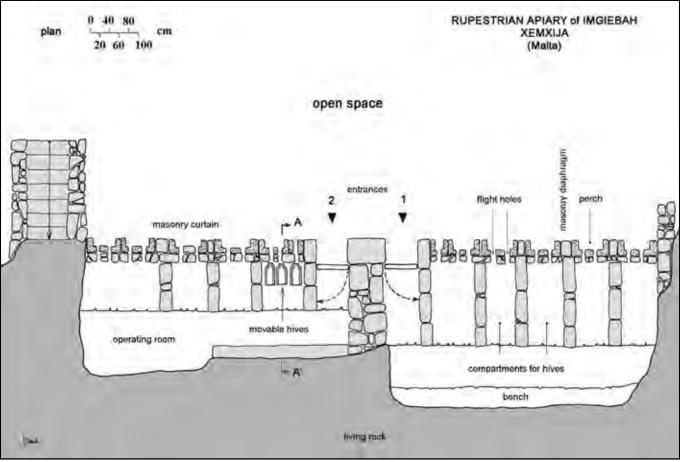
Malta. Apiary of Imgiebah: plan (drawing R. Bixio). Fig. 10 - Malta. Apiario di Imgiebah: pianta (grafica R. Bixio).
